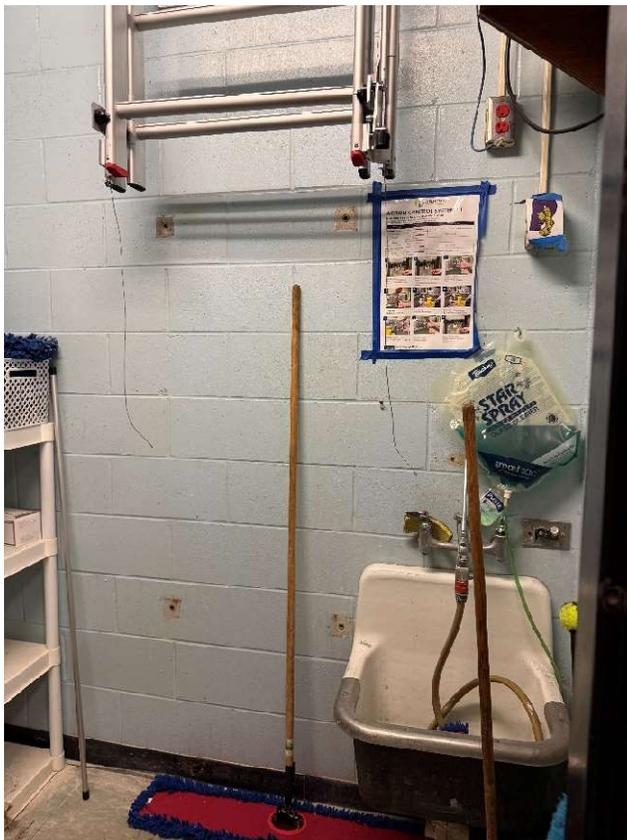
Install roof hatch and remove materials and equipment from site.
